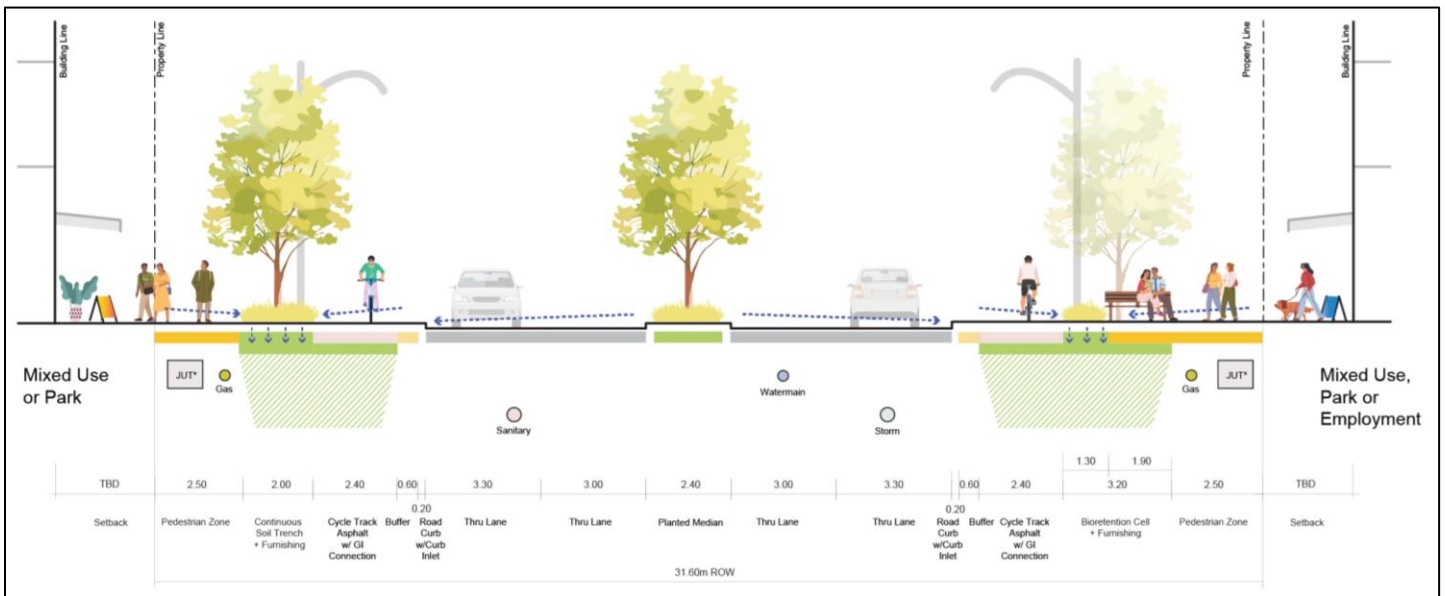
Northern Street (Sheppard Avenue West to Billy Bishop Way) Cross-Section – Option 2
